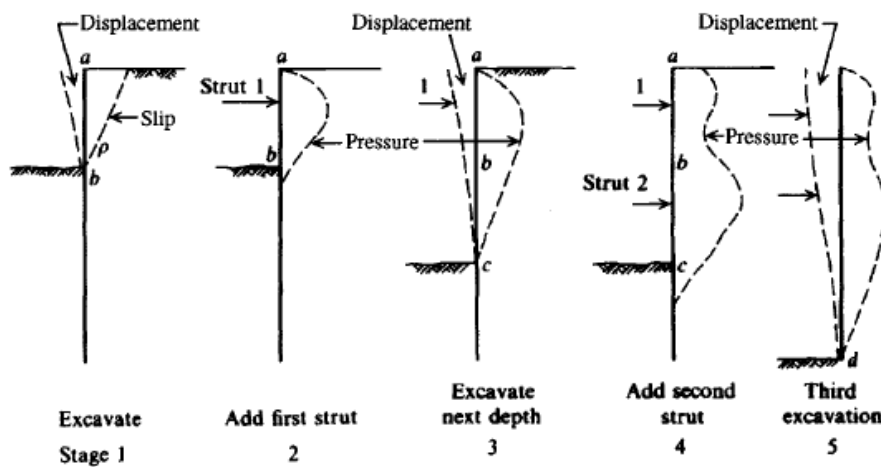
Development of Wall Movement in Braced Excavation (Bowles, 1999)
